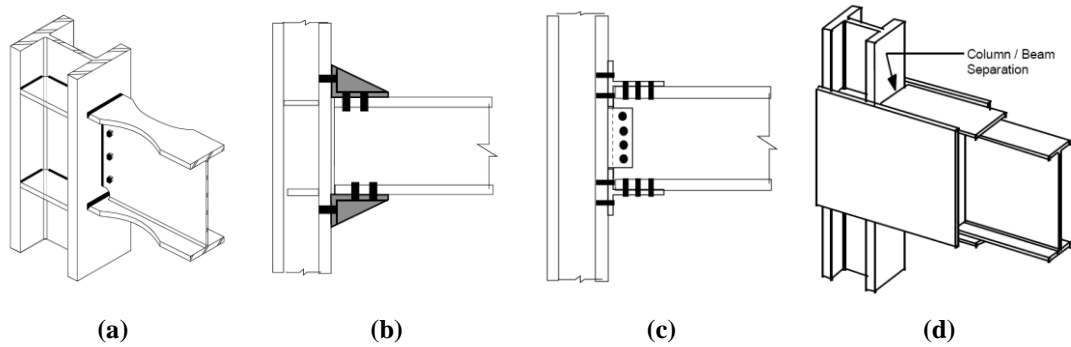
Solutions proposed to enhance the moment beam-column connection: (a) reduced beam section, (b) added haunches or brackets, (c) T-stubs solution and (d) proprietary side plate connection (FEMA 351, 2000).
